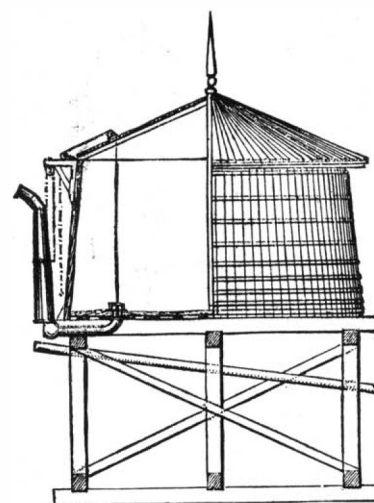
RESERVOIR. (Scale, 7-1080.)
